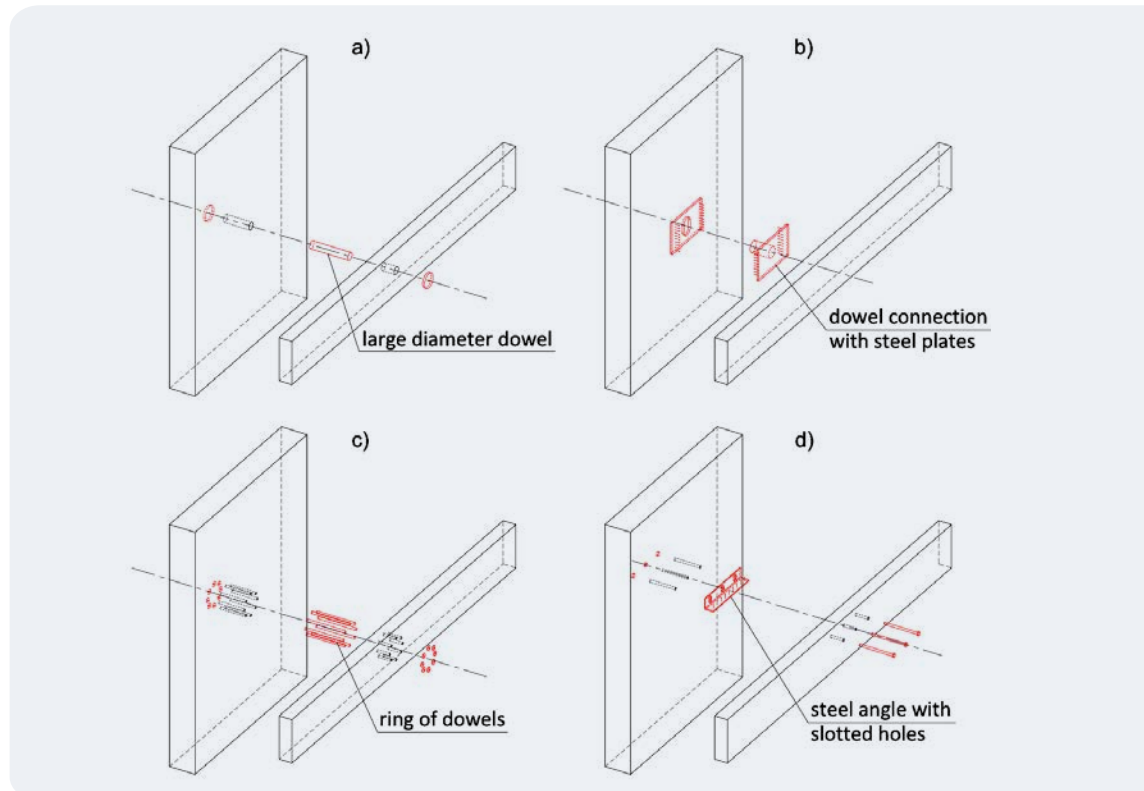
Suggested diaphragm-to-wall connection details: a) large diameter dowel connection (timber-timber); b) dowel connection (steel-steel); c) multiple dowel connection (timber-timber); and d) steel angle with slotted holes.
